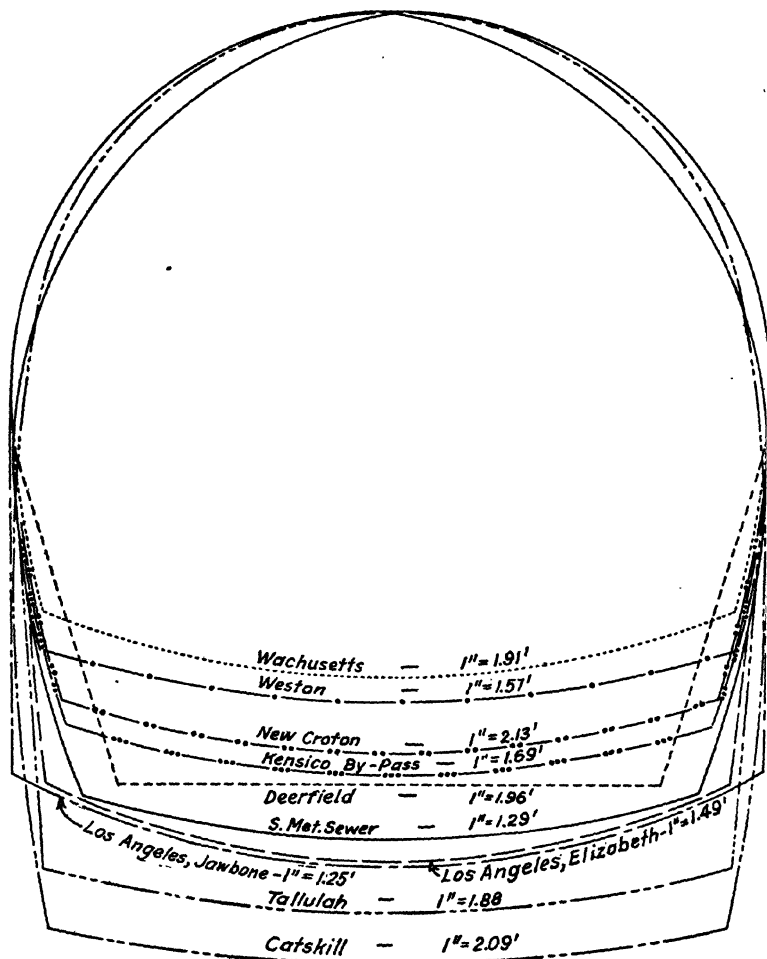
Composite Tunnel Sections Plotted with Equal Width.
